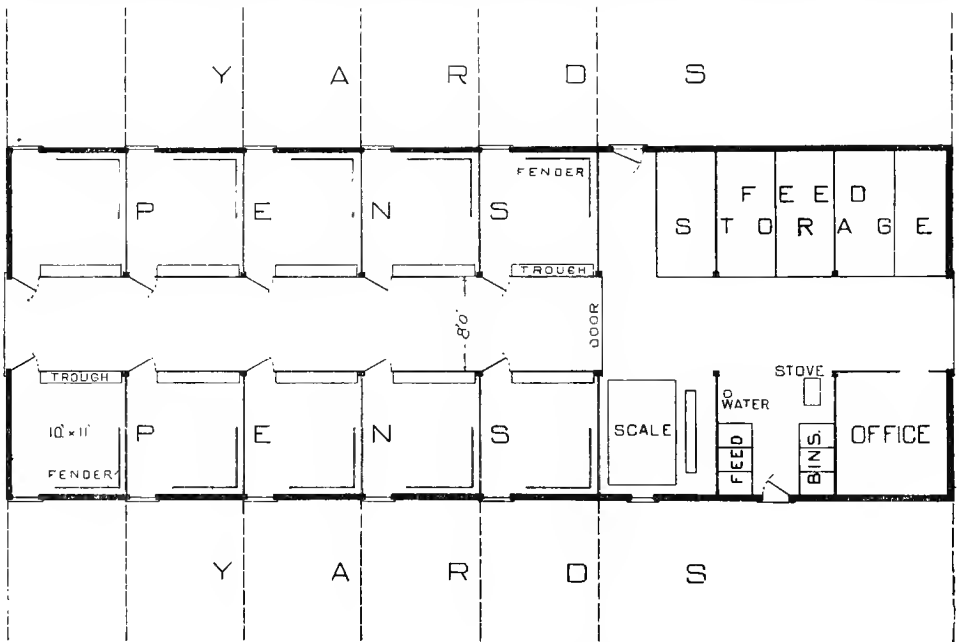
FLOOR PLAN (PORTION) OF WELL-LIGHTED PIGGERY.
